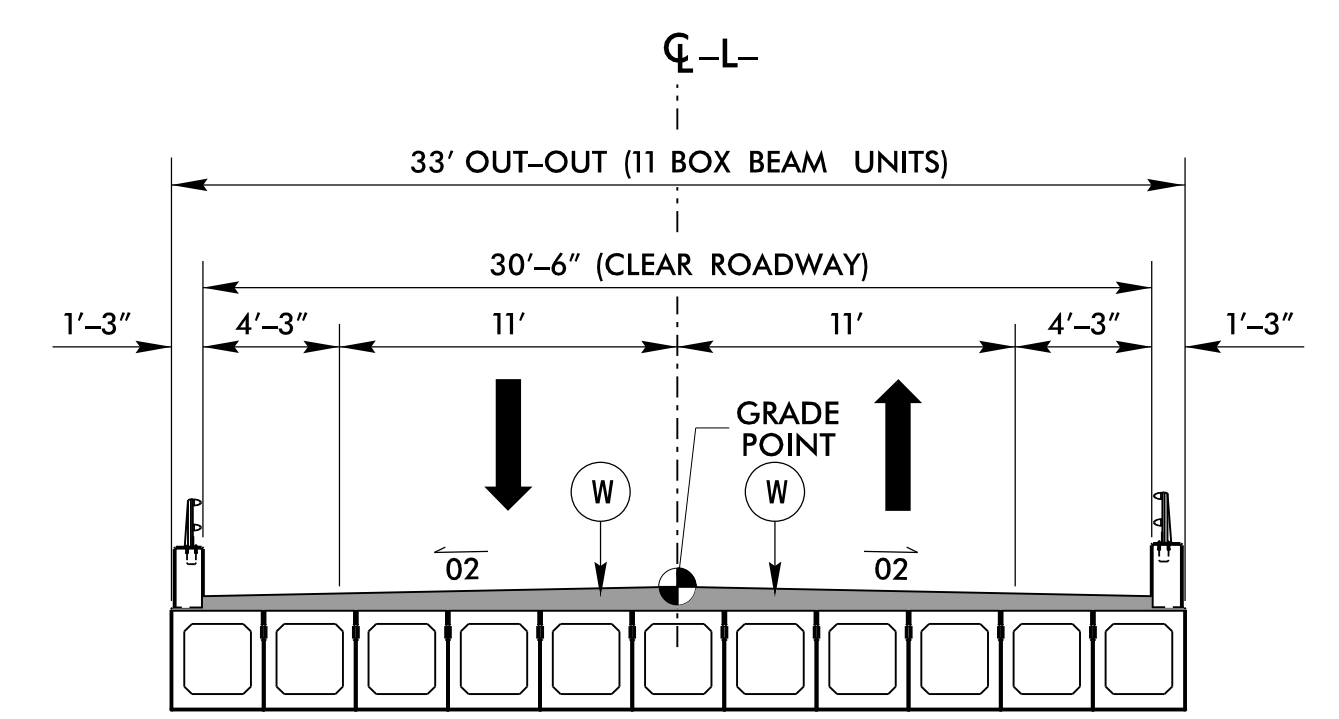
DETAIL SHOWING PAVING TO THE FACE OF GUARDRAIL
